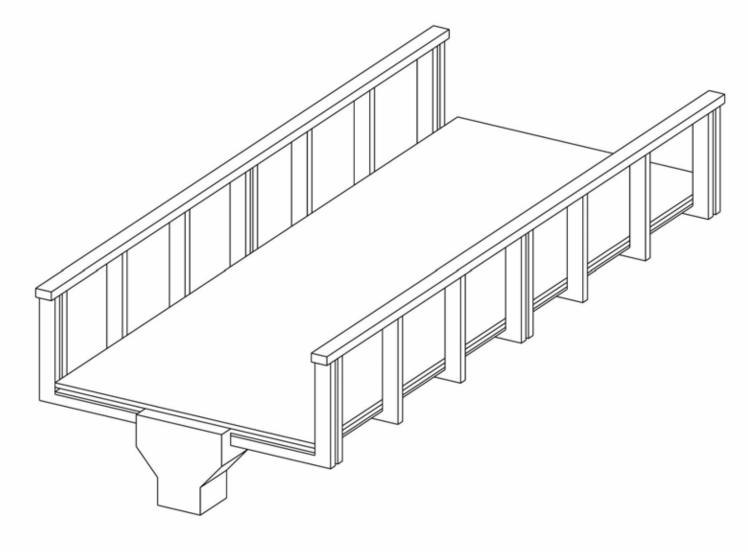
A.16.7 Sections of bridge could be replaced by a wider section (ideally at least 4m wide). Trees may be impacted and the proximity to the road may be an issue. (Not to scale).
